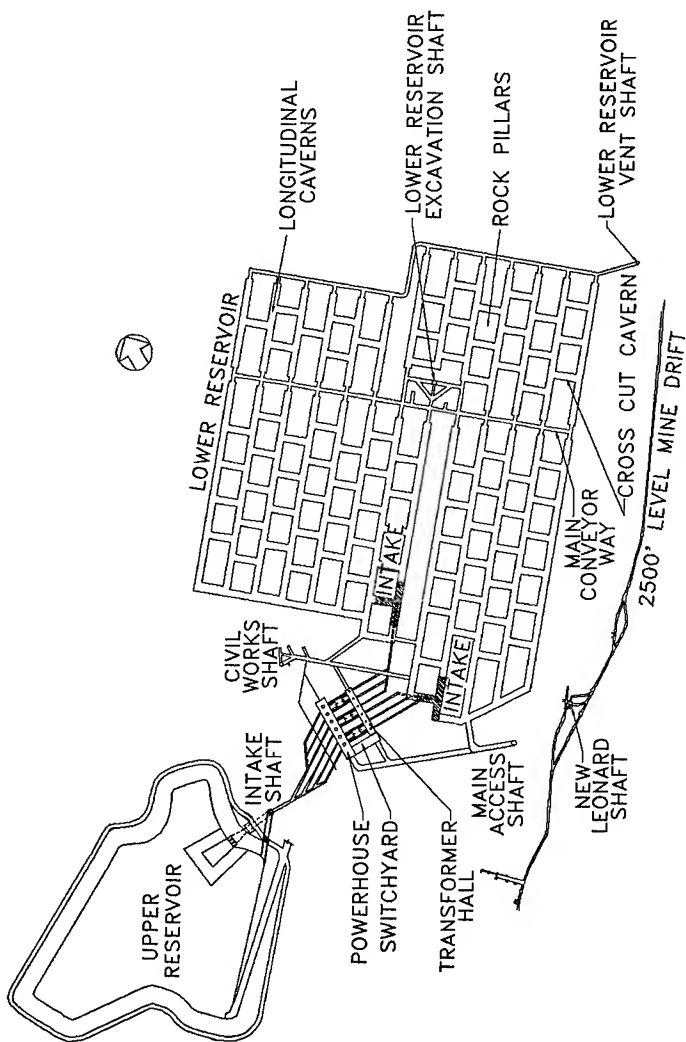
MT. HOPE WATERPOWER PROJECT - PLAN
